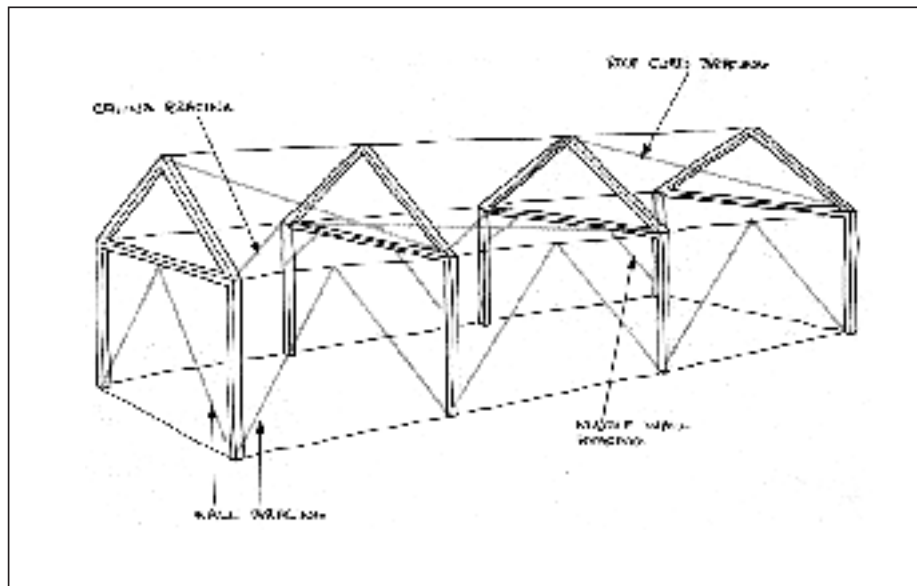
With conventionally framed buildings, plywood sheathing braces the building. Pole barns lack rigid sheathing, so bracing must be added throughout the structure.
